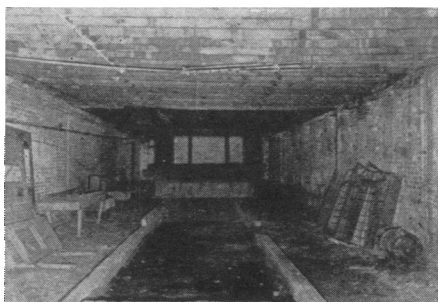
Rat proofing of cellar. Low wooden floor removed. Abandoned store fixtures in center and elevated above earth floor.
